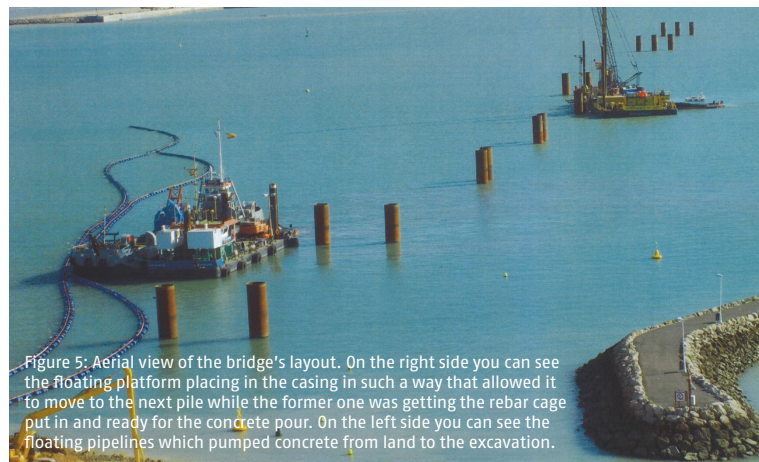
Aerial view of the bridge's layout. On the right side you can see the floating platform placing in the casing in such a way that allowed it to move to the next pile while the former one was getting the rebar cage put in and ready for the concrete pour. On the left side you can see the floating pipelines which pumped concrete from land to the excavation.
